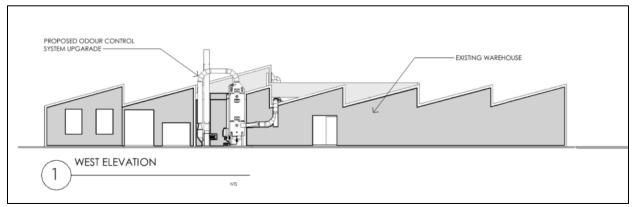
West Elevation of proposal (Source: Watch This Space Design, 2025)
